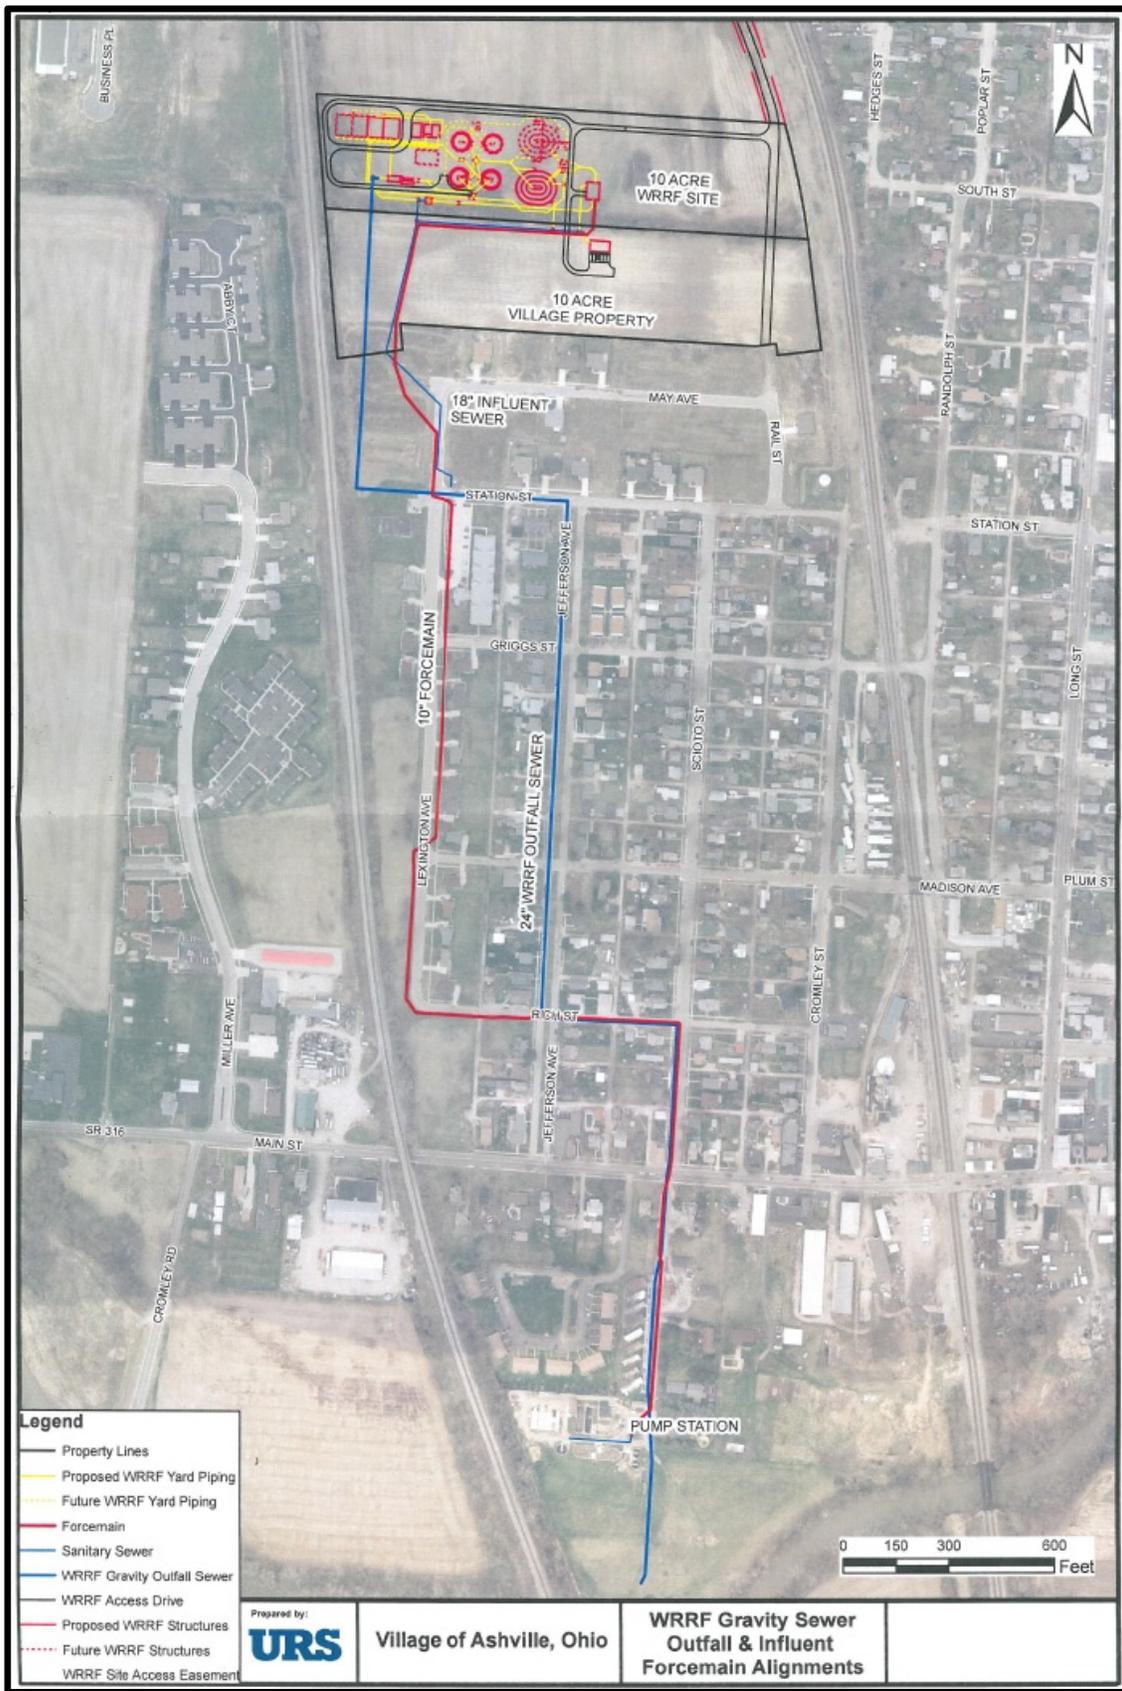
Ashville New Water Resource Recovery Facility HAB Project Plan Map
